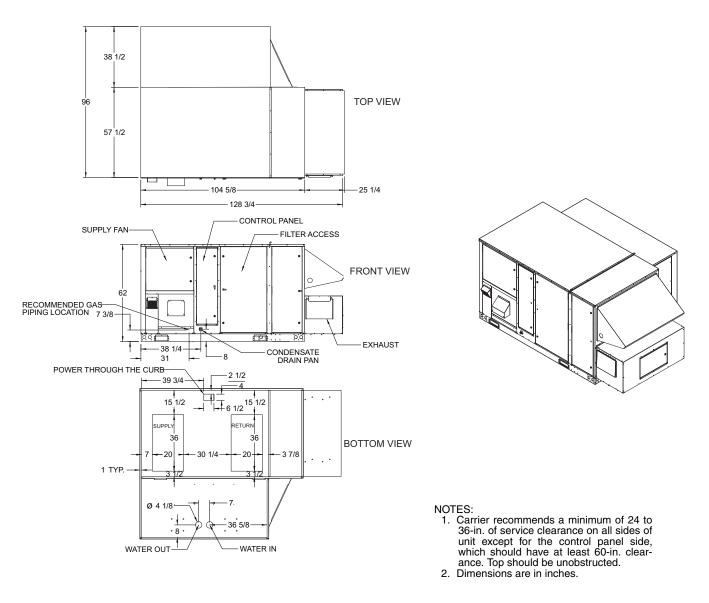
Unit Dimensions — 62RC,RD07-09 Units with Optional Energy Conservation Wheel
